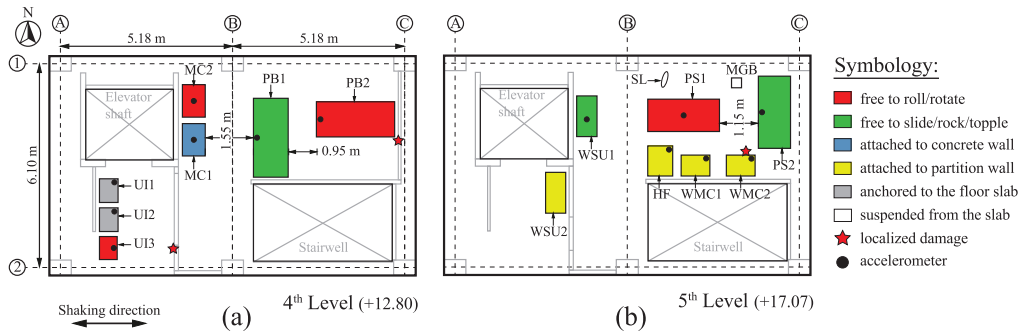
Medical equipment arrangement on the (a) fourth and (b) fifth building floor levels indicating their support conditions and the possibility of rolling, rotating, sliding, rocking, or toppling.
